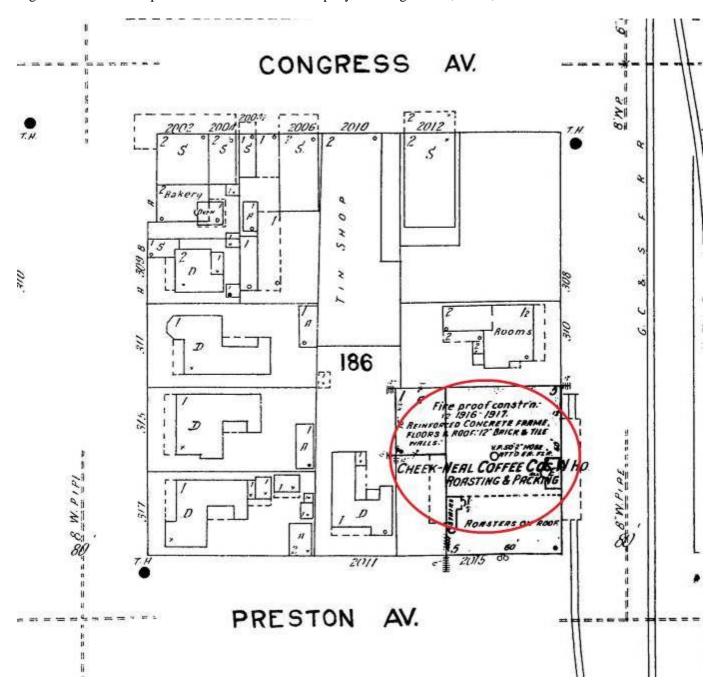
Site Plan – Cheek-Neal Coffee Company Building
